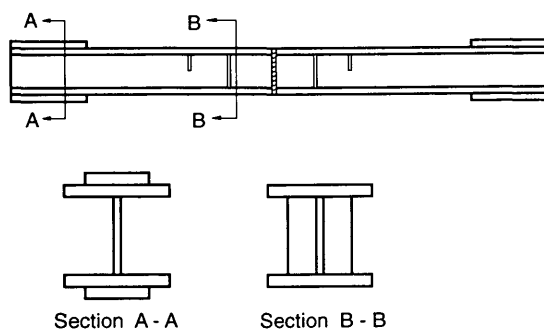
Elevation of full-scale beam sample, showing details of two sections.
